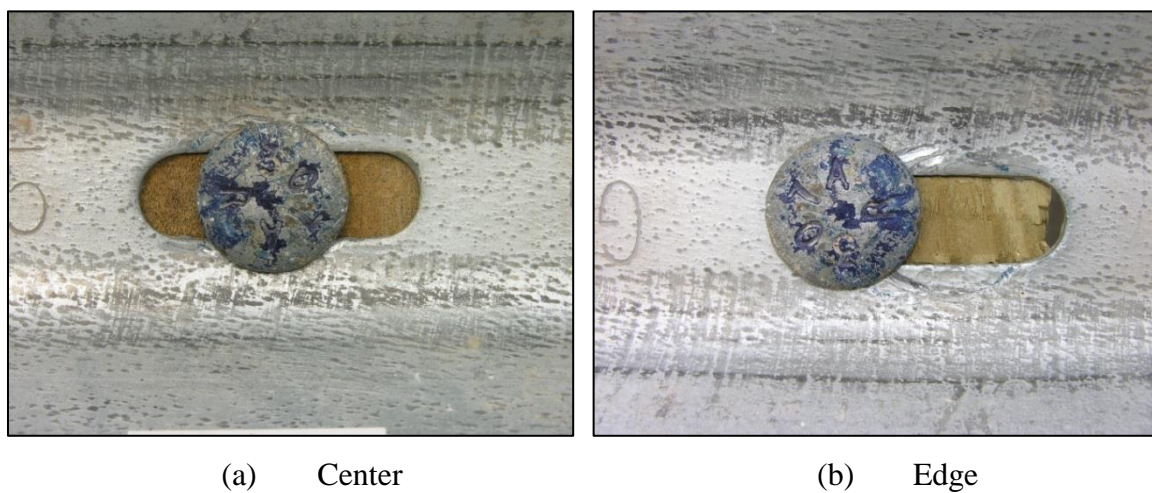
Bolt Placement at (a) Center and (b) Edge of Guardrail Bolt Slot
